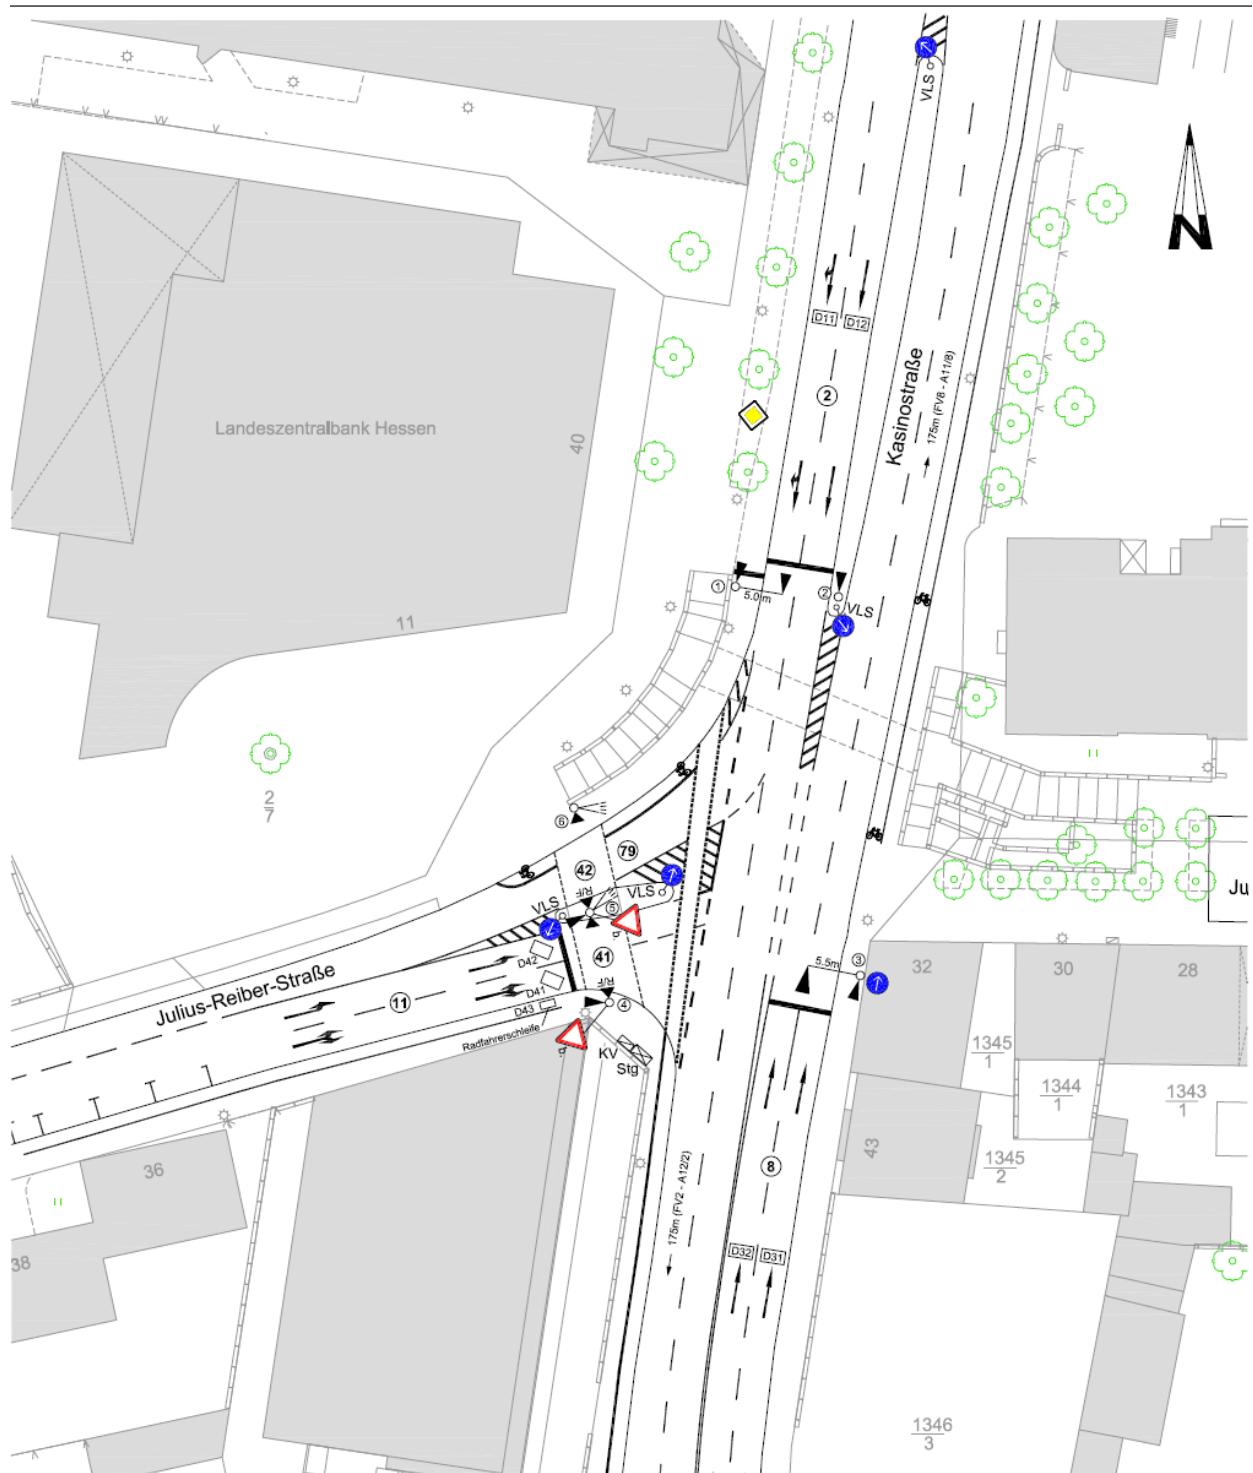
Junction Layout of A24 intersection, Darmstadt (Source: Darmstadt Town hall)
